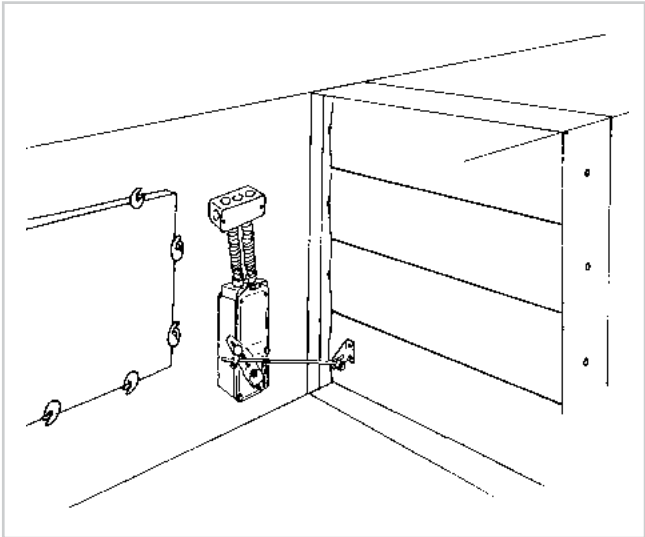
Actuator with linkage mounted in the airstream using ZG-AFB crank arm adapter kit
